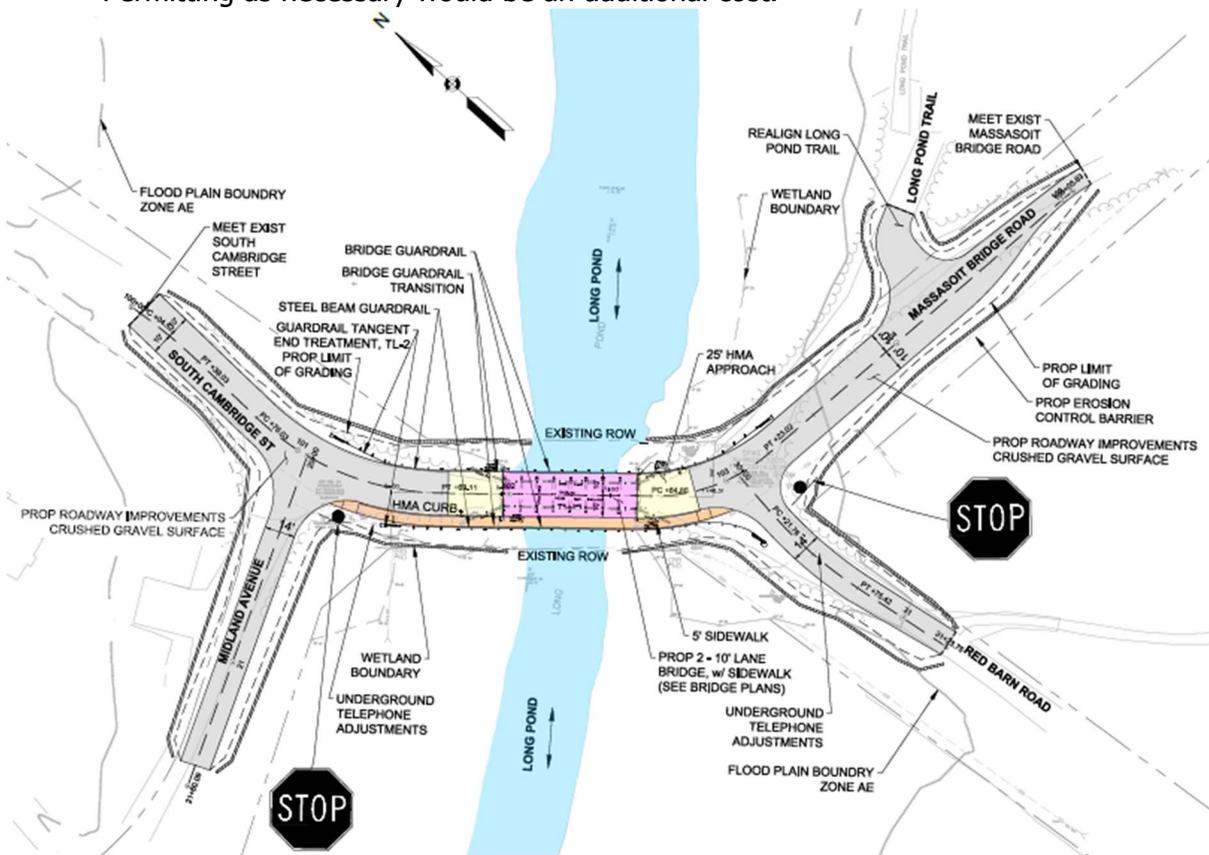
Two-lane Bridge with Sidewalks (Massasoit Bridge)
